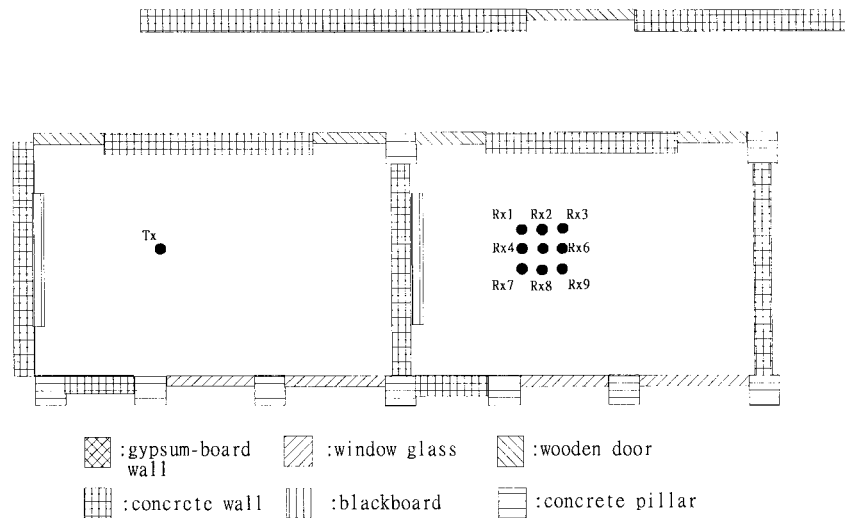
Floor layout of measurement site 6 is shown by the patched-wall model.
